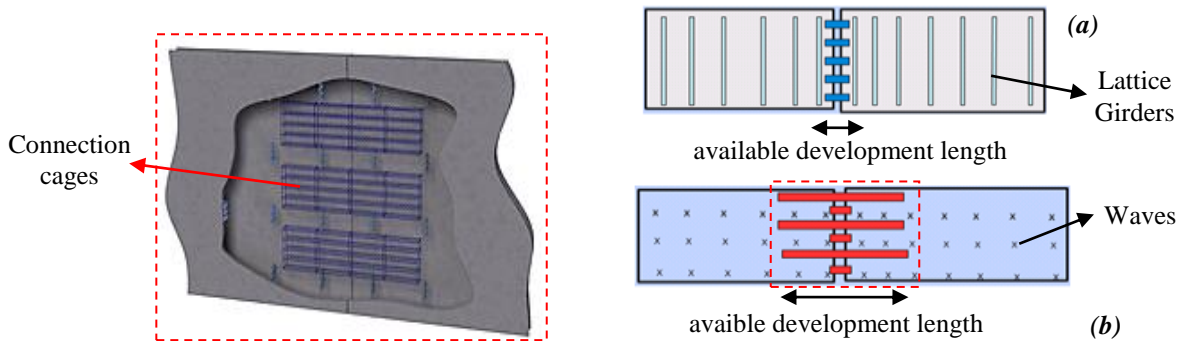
Continuity reinforcement application in (a) lattice girders and (b) steel waves
